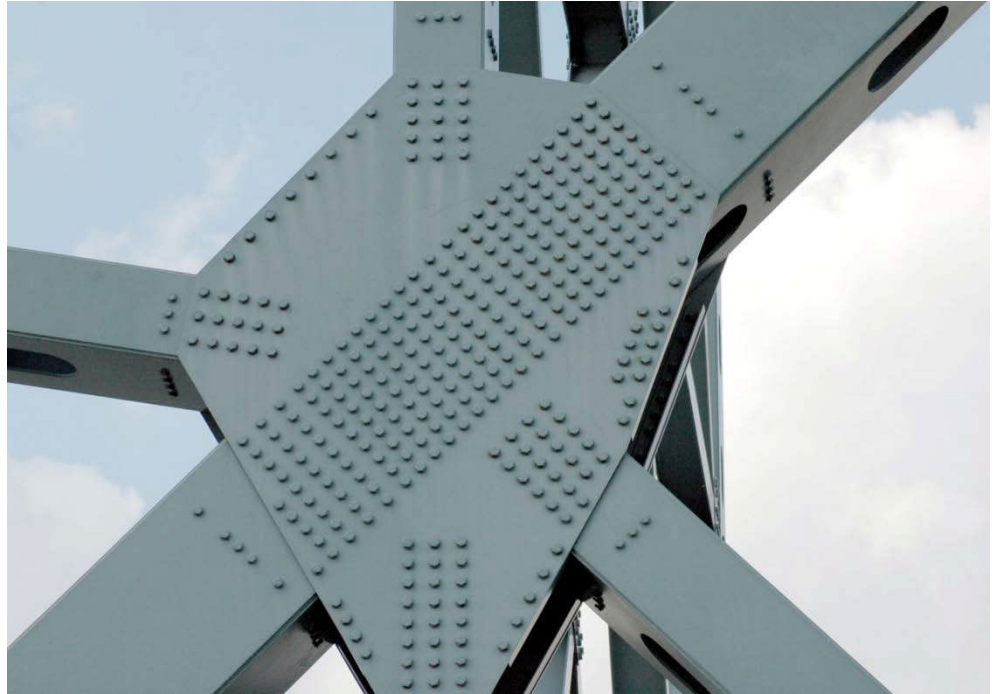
Odd-Shaped Gusset Plate Connecting Primary Load-Carrying Truss Members
